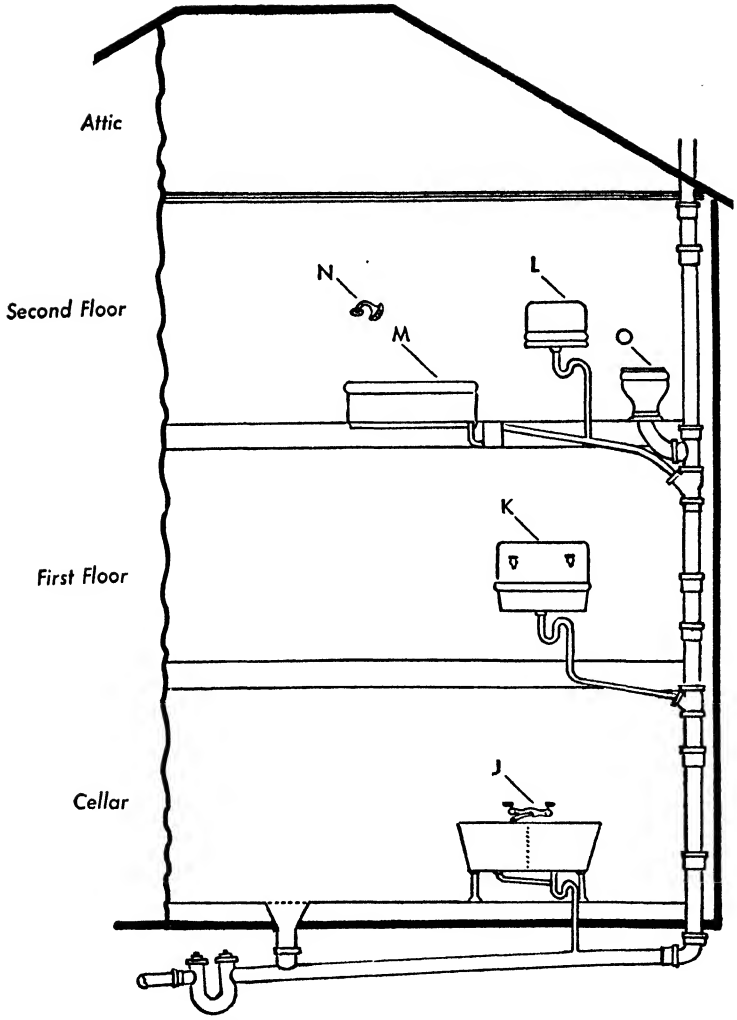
House Diagram Showing Arrangement of Soil (Waste or Sewer) Pipes
